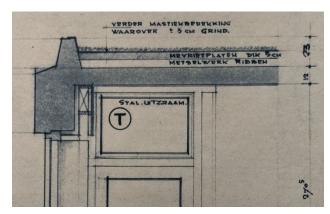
Block VII: Roof structure - Concrete slab and concrete insulation panels
